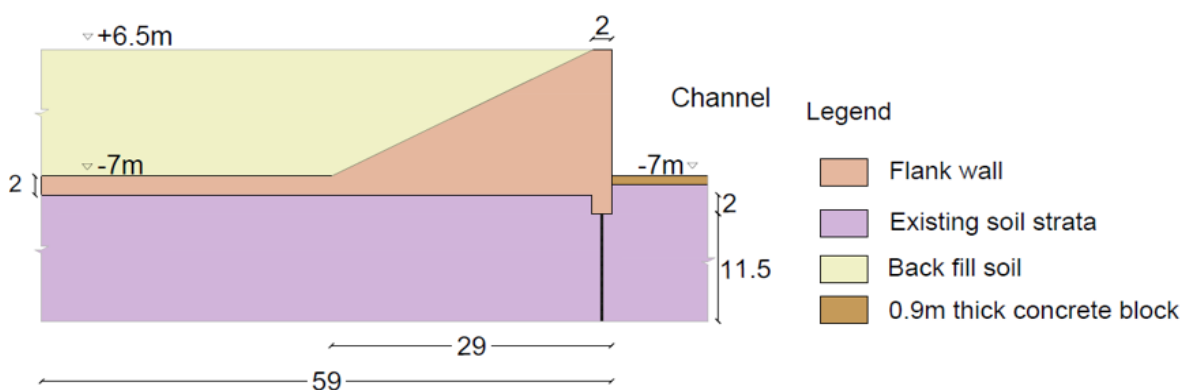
Cross Section of Upstream Vertical Flank Wall
